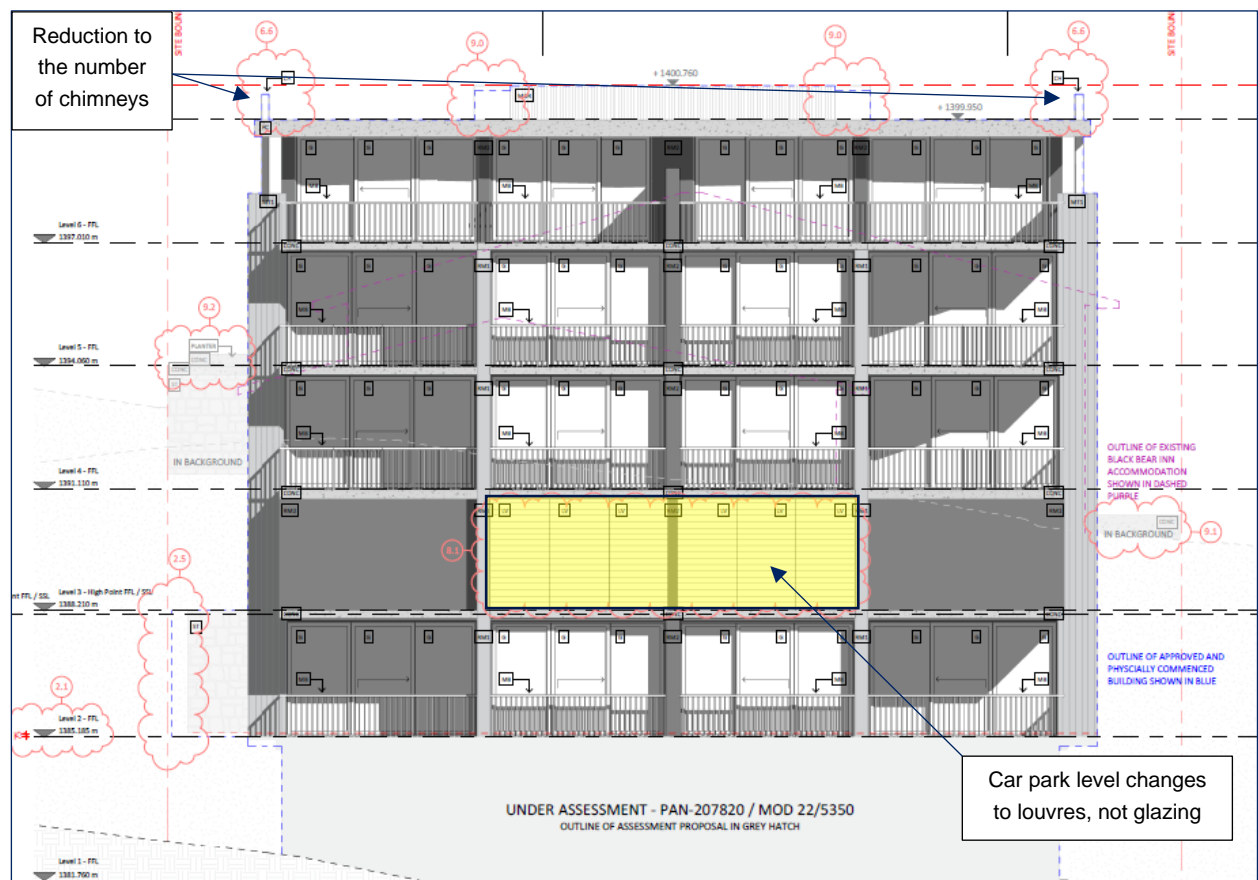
| Amended northern elevation (Source: Applicant's documentation)
